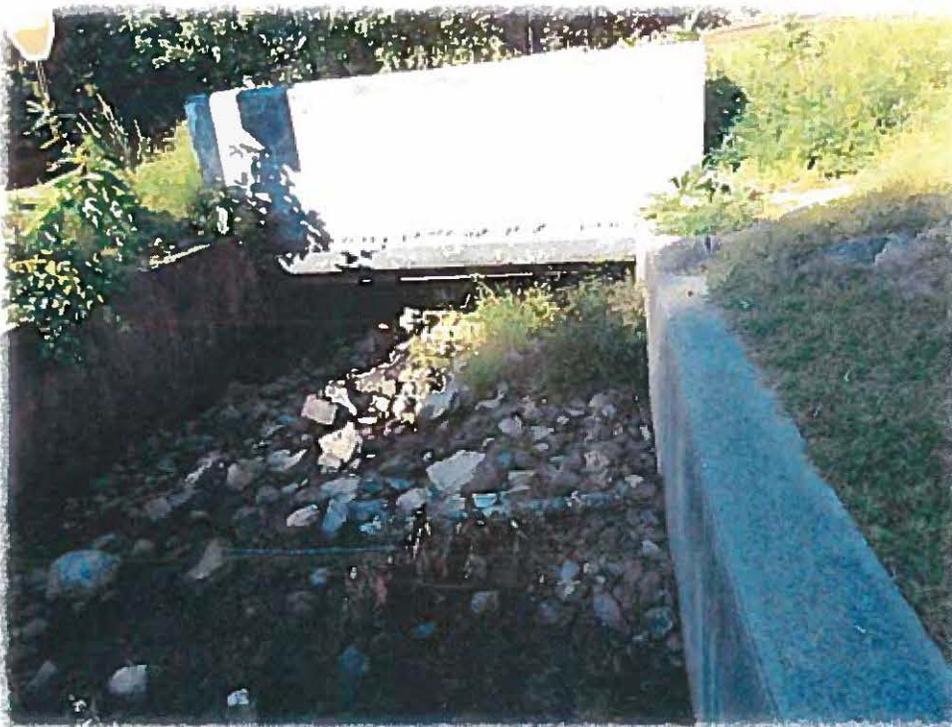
Daniels Farm Road Box Culvert at Hedgehog Road – Upstream Headwall
